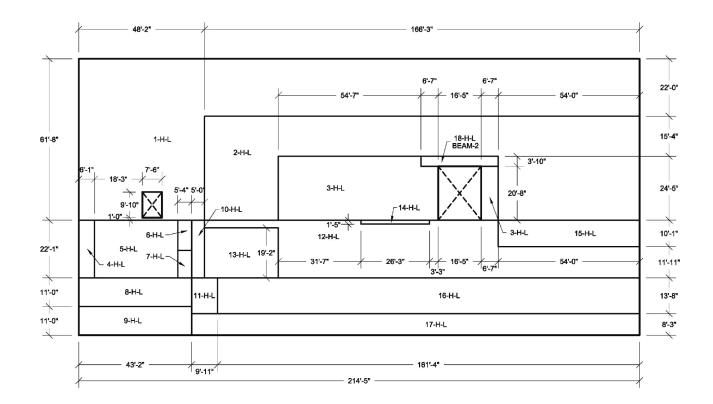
H.3-8 North Wall Looking South Horizontal Reinforcement Zones Near Side Face
